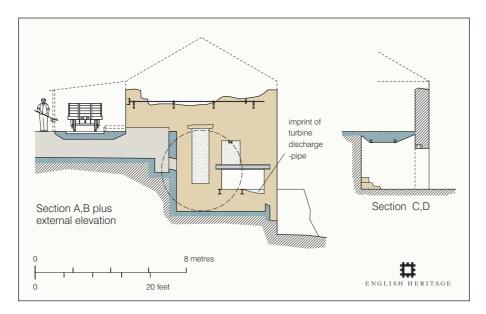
EH cross sections of the glazing house (see page xiv for key to conventions).
